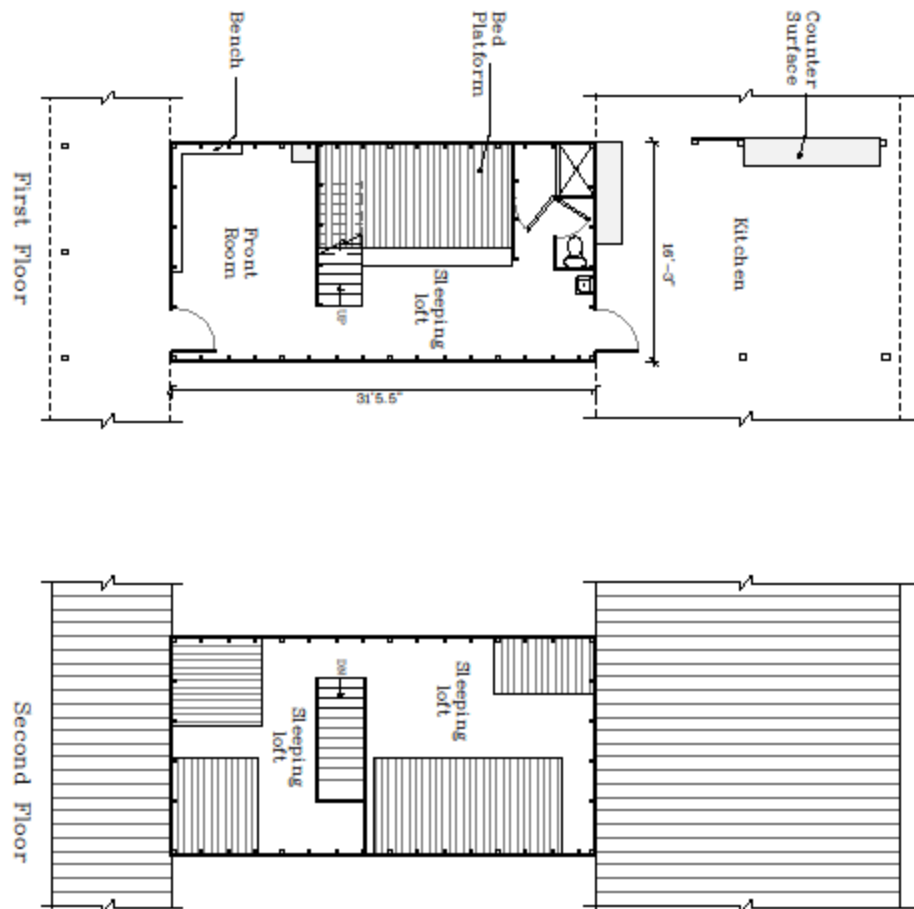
Floor Plan of Tent 9 at Cattle Creek
